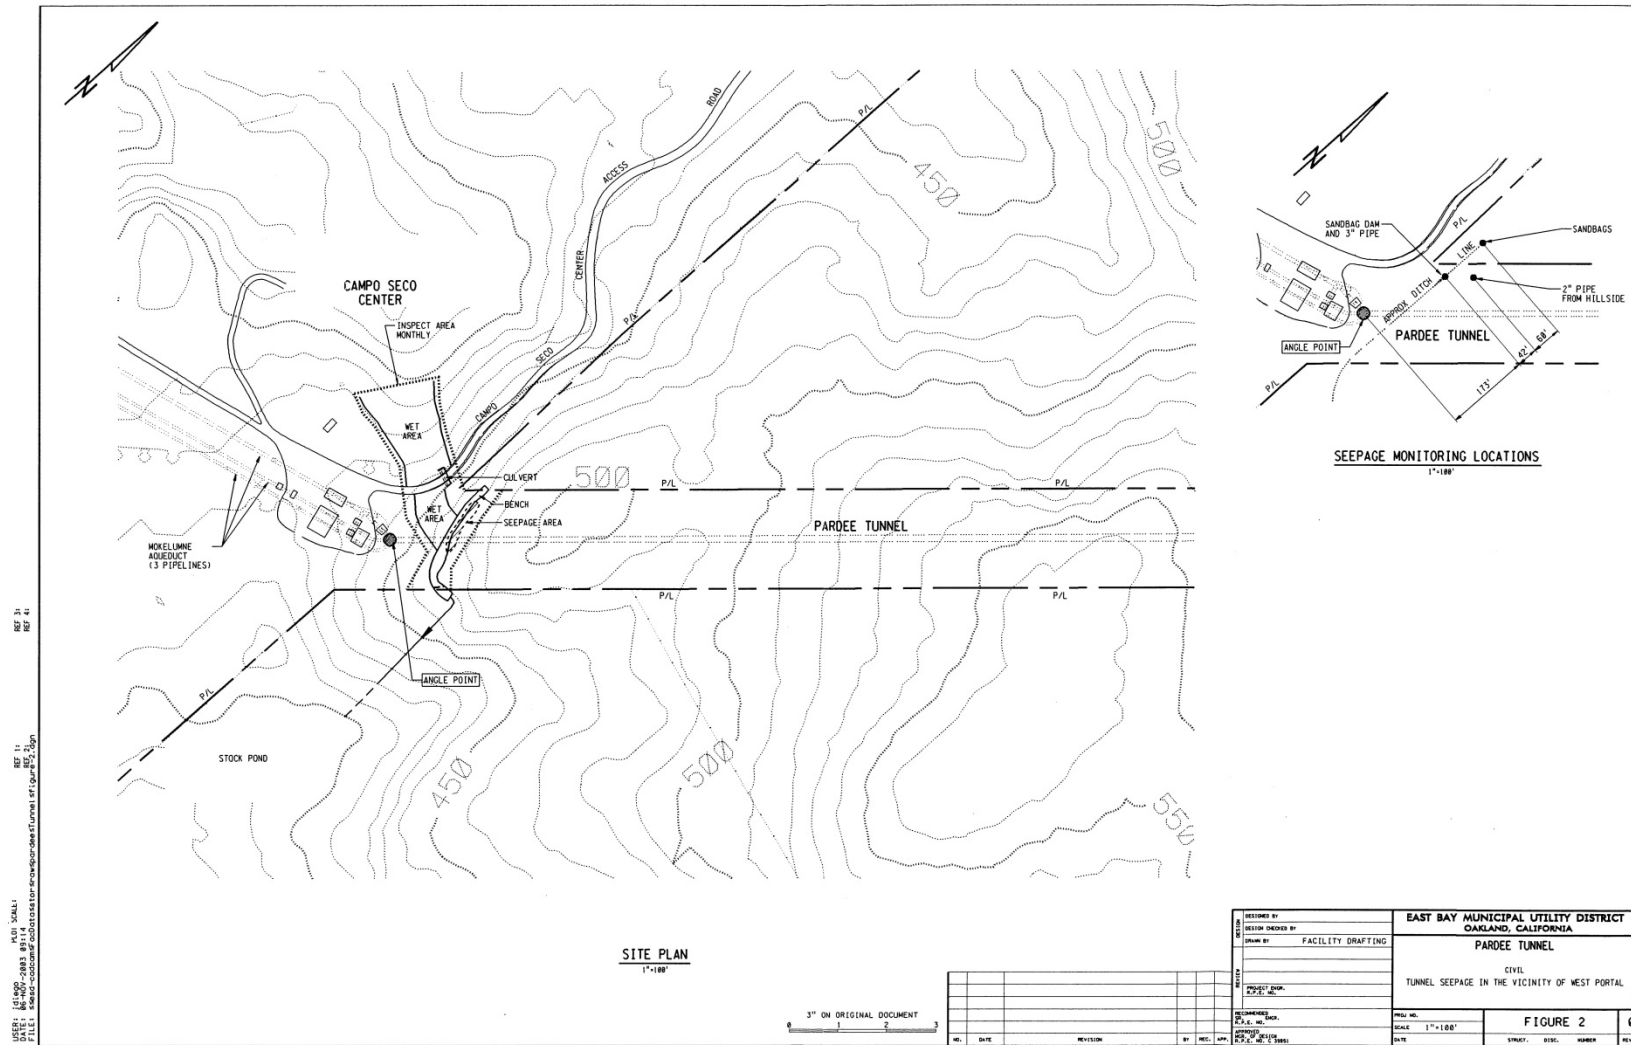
Pardee Tunnel: Plan at Campo Seco Center showing Seepage Areas
